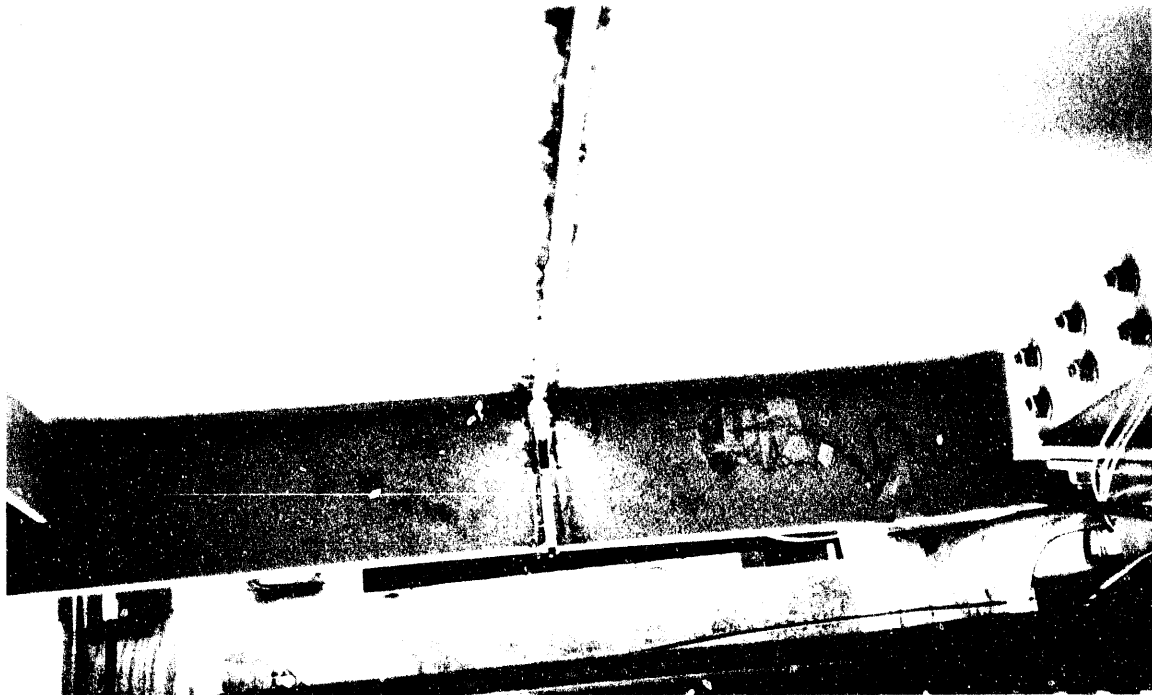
Fourth Stage of Damage: Six -foot cut in the web and cut through the entire bottom flange.
